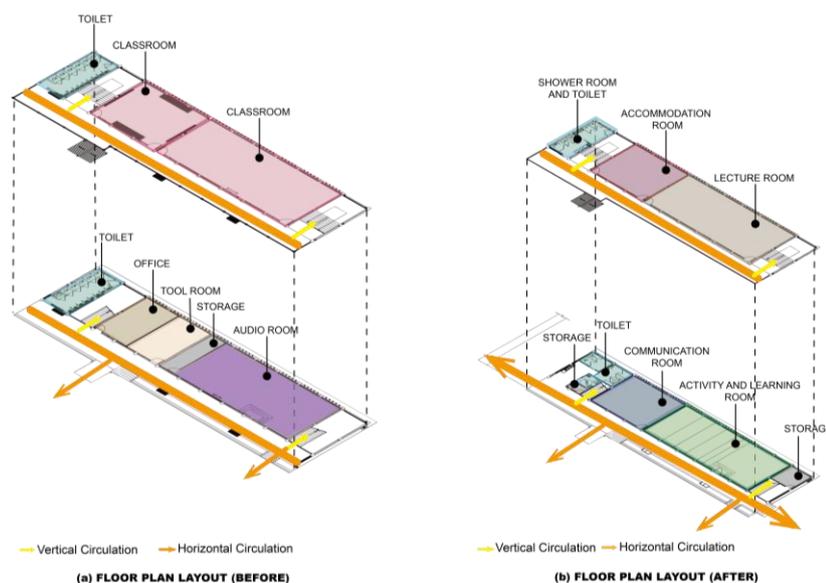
Floor Plans: (a)(b) CheCheng Elementary School WenCyuan Branch Floor Plans.
